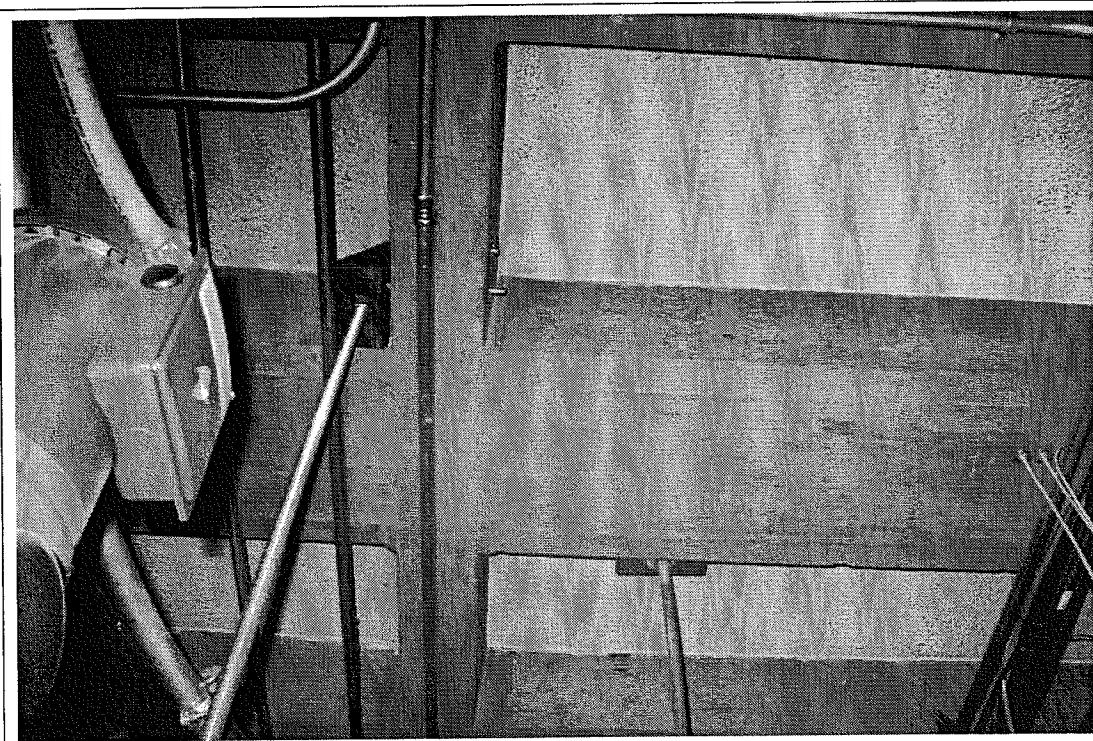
Fireproofing applied to concrete deck channels above West Baggage Handling area (FS2)
